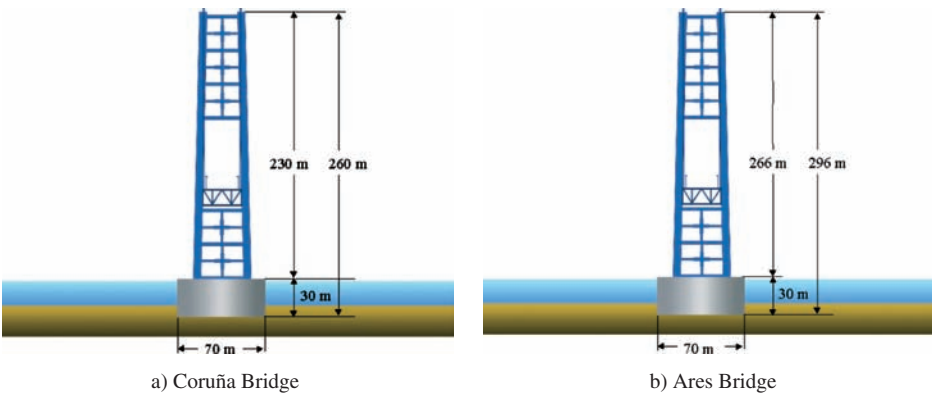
Towers of suspension bridges. (a) Coruña Bridge. (b) Ares Bridge.
